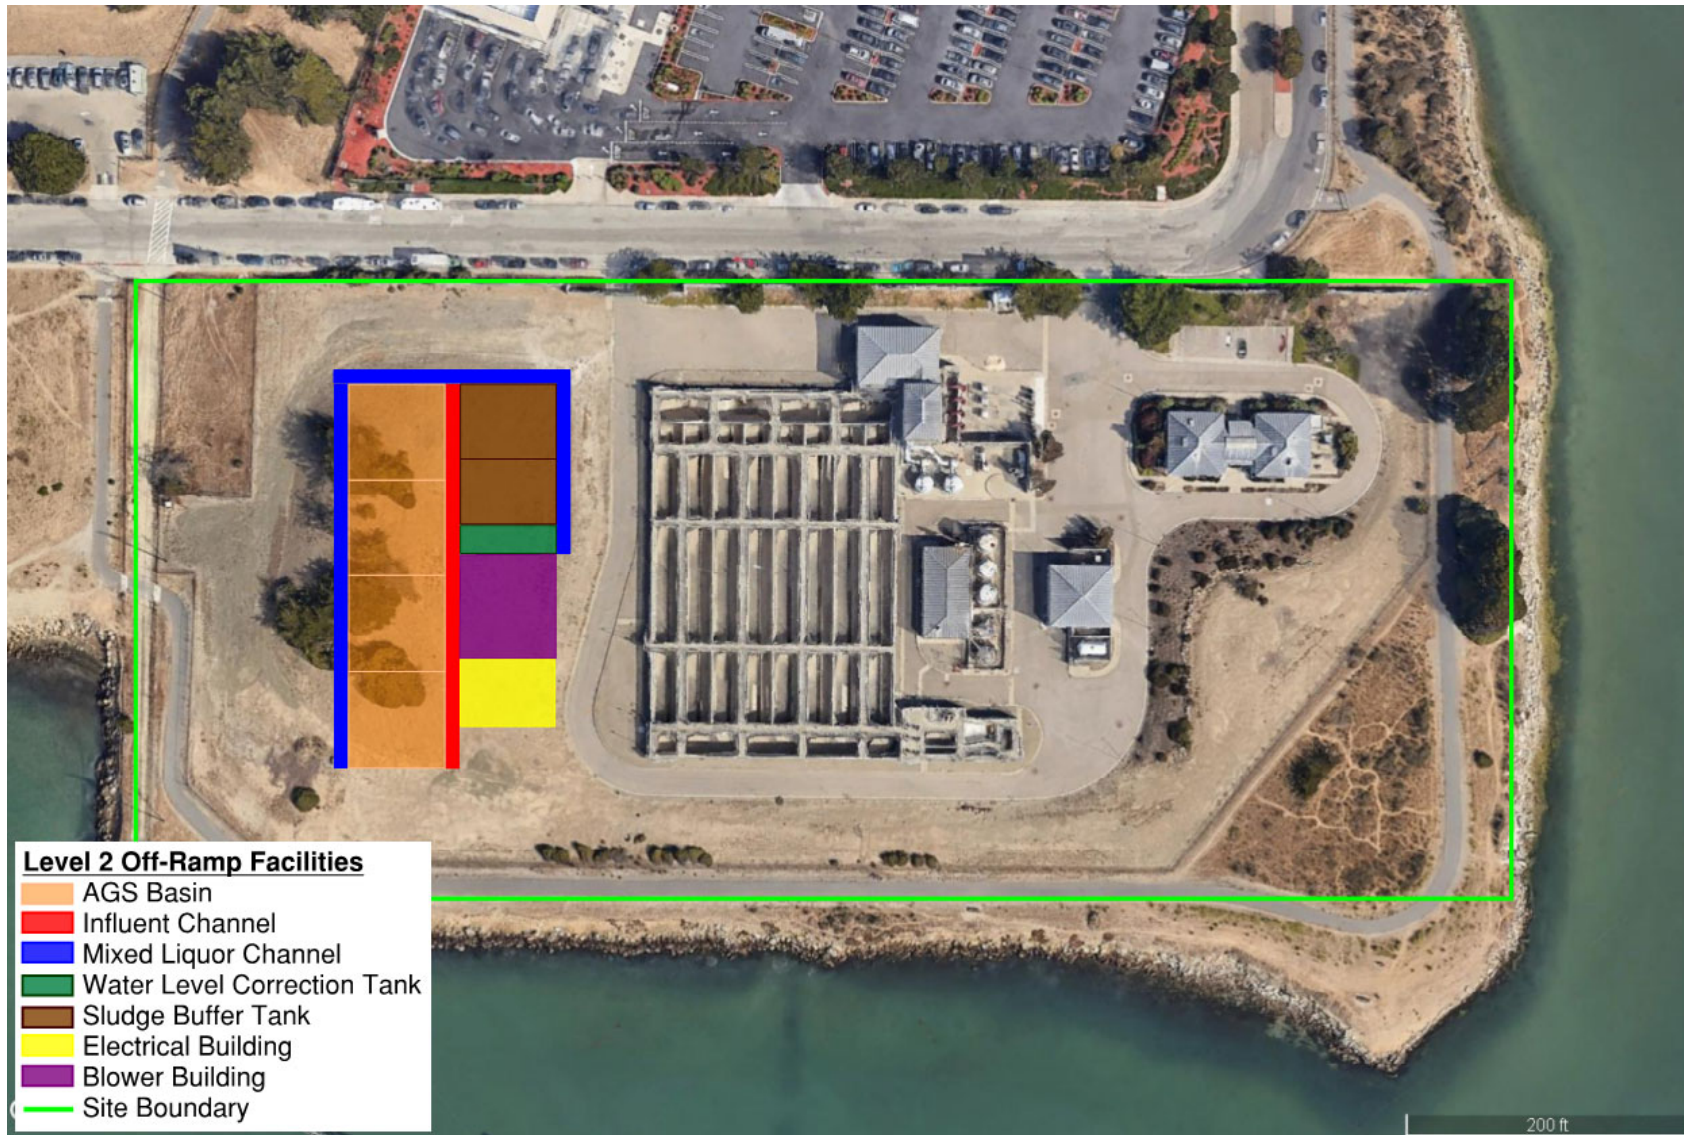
Alternative 6 Decentralized – Conceptual Site Layout for Pt. Isabel WWF
